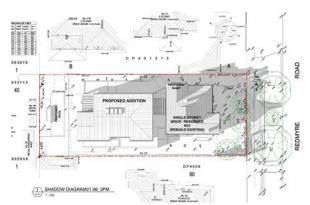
Shadow diagrams of the proposed rear addition and existing dwelling house.
